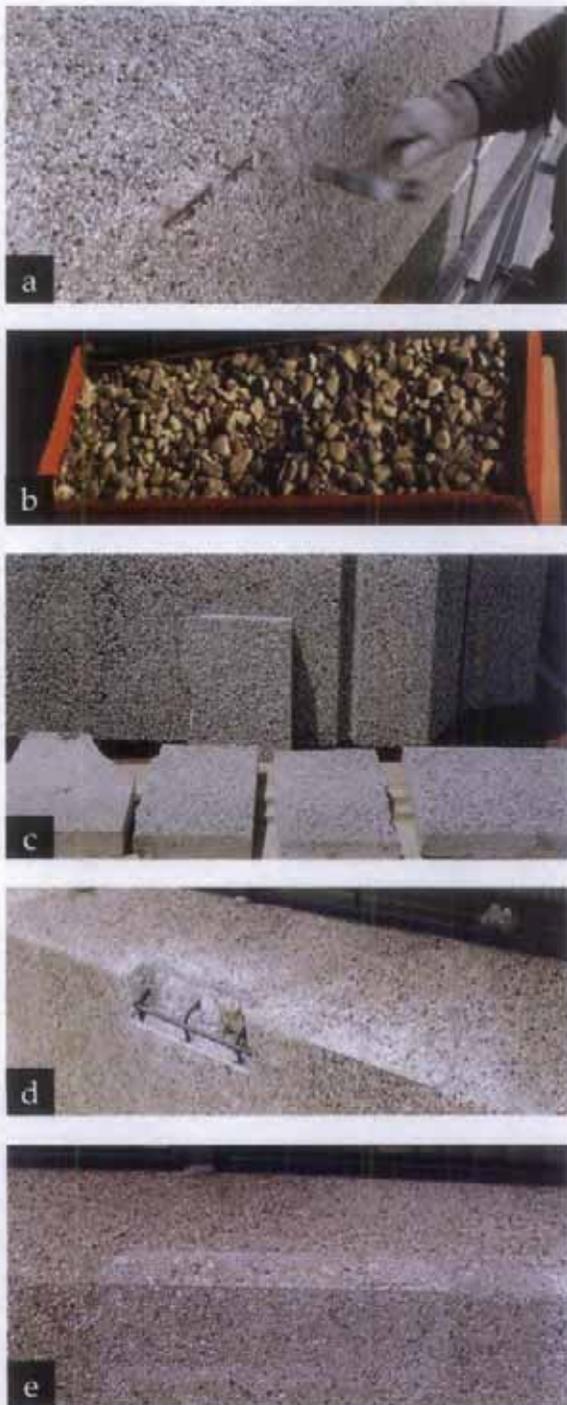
(a) Exposed aggregate precast concrete is sounded with a hammer to detect areas of deterioration. Corrosion of the exposed reinforcing steel bar has led to spalling of the adjacent concrete. (b) Samples of aggregate considered for use in repair concrete are compared to the original concrete materials in terms of size, color, texture, and reflectance. (c) Various sample panels are made using the selected concrete repair mix design for comparison to the original concrete on the building, and the mix design is adjusted based on review of the samples. (d) After removal of the spall, the concrete surface is prepared for installation of a formed patch. (e) Prior to placement of the concrete, a retarding agent is brush-applied to the inside face of the formwork to slow curing at the surface. After the concrete is partially cured, the forms are removed and the surface of the concrete is rubbed to remove some of the paste and expose the aggregate to match the original concrete.
